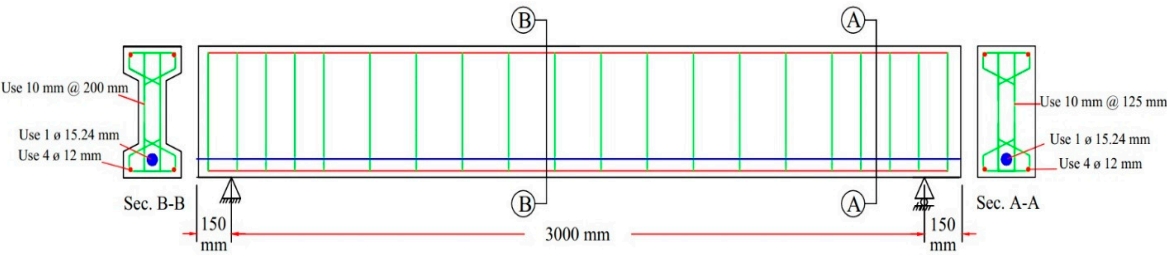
Reinforcement detail for Post-tensioned I-beam with end blocks.
